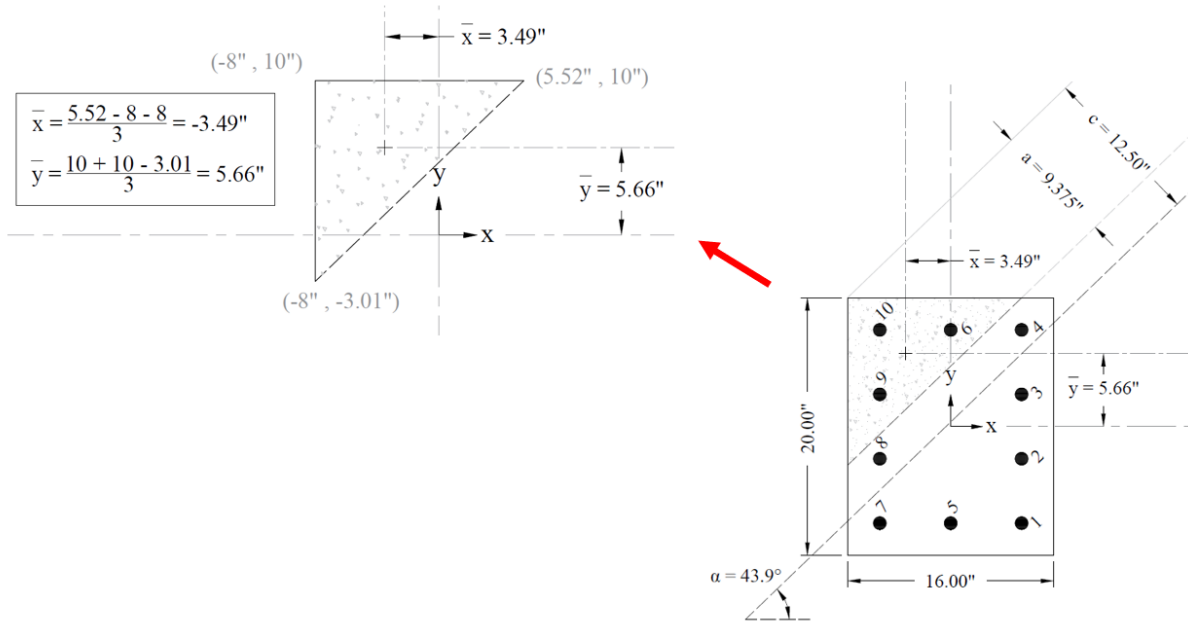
Cracked Concrete Column Section Centroid Calculations
